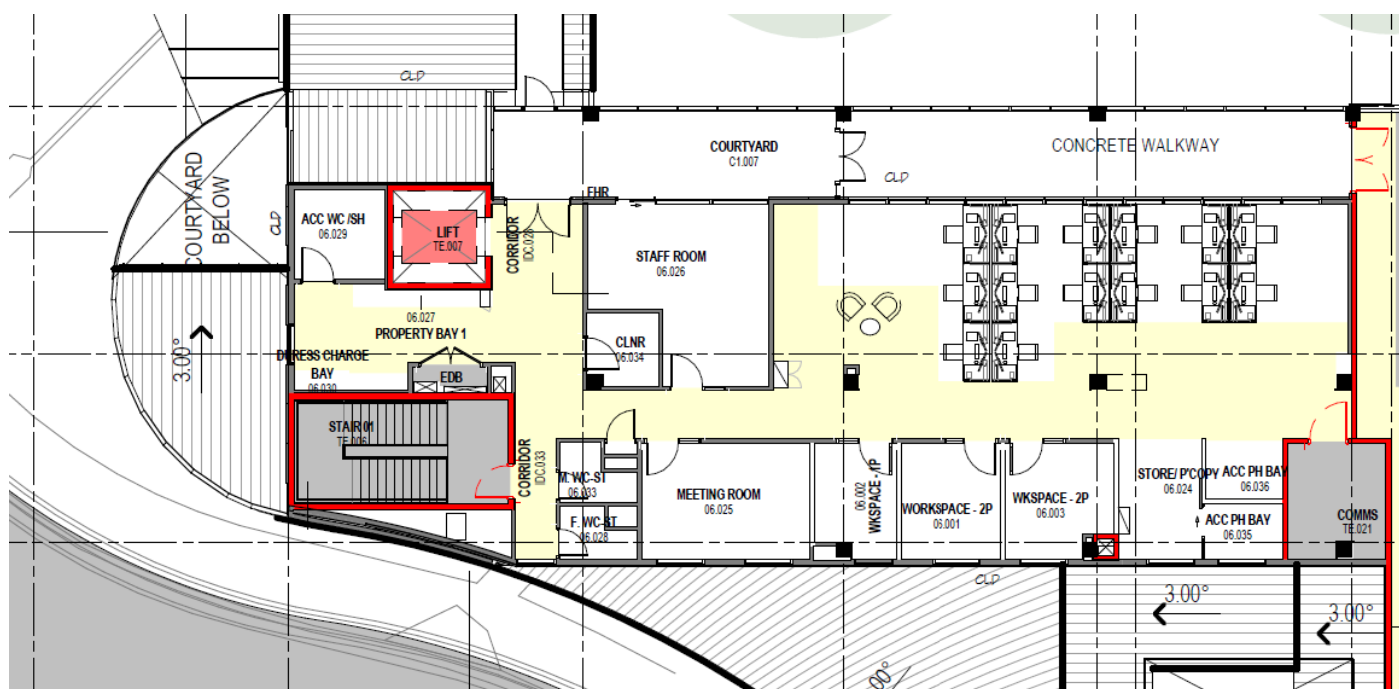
Section of Level 03 Floor Plan showing location of end-of-trip shower and property bay (lockers) on Level 3 and proximity to staff lift. Source: Architectural drawing A20-300(H) by STH.
